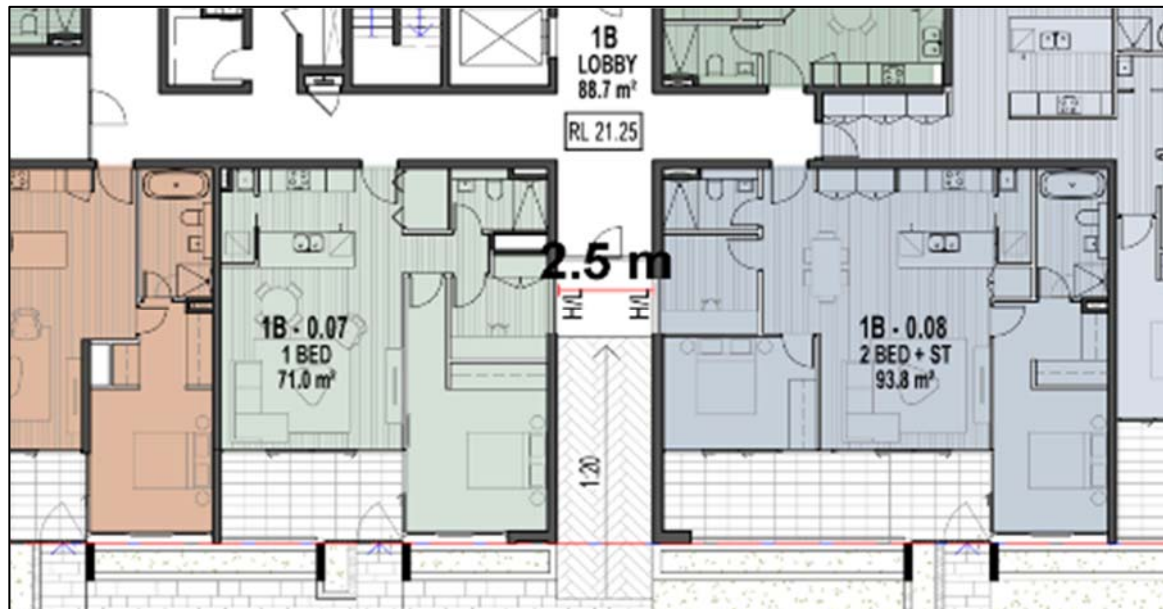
Ground floor building 1B – study windows are within an internal circulation corridor and in close proximity to each other.
